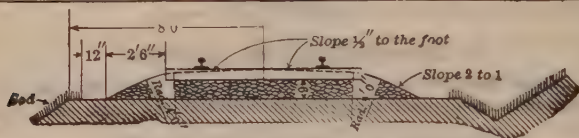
Standard Ballast Sections, Class A Roadbeds
